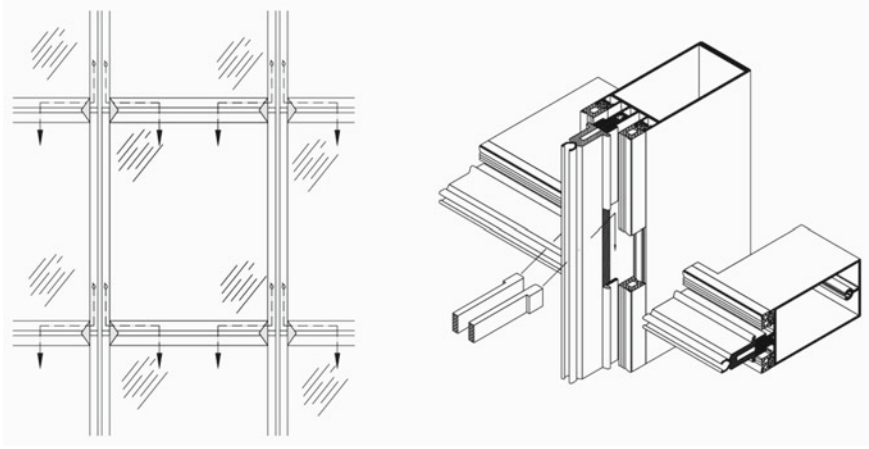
Framings of the façade systems guarantee the drainage of rainwater, infiltration and condensation through: • the collection in the lower transoms of each façade module (fixed or openable); • the sealing of the openings and the frame joints; • the application of the joint plugs between the mullions and the transoms. © Courtesy of Schüco
